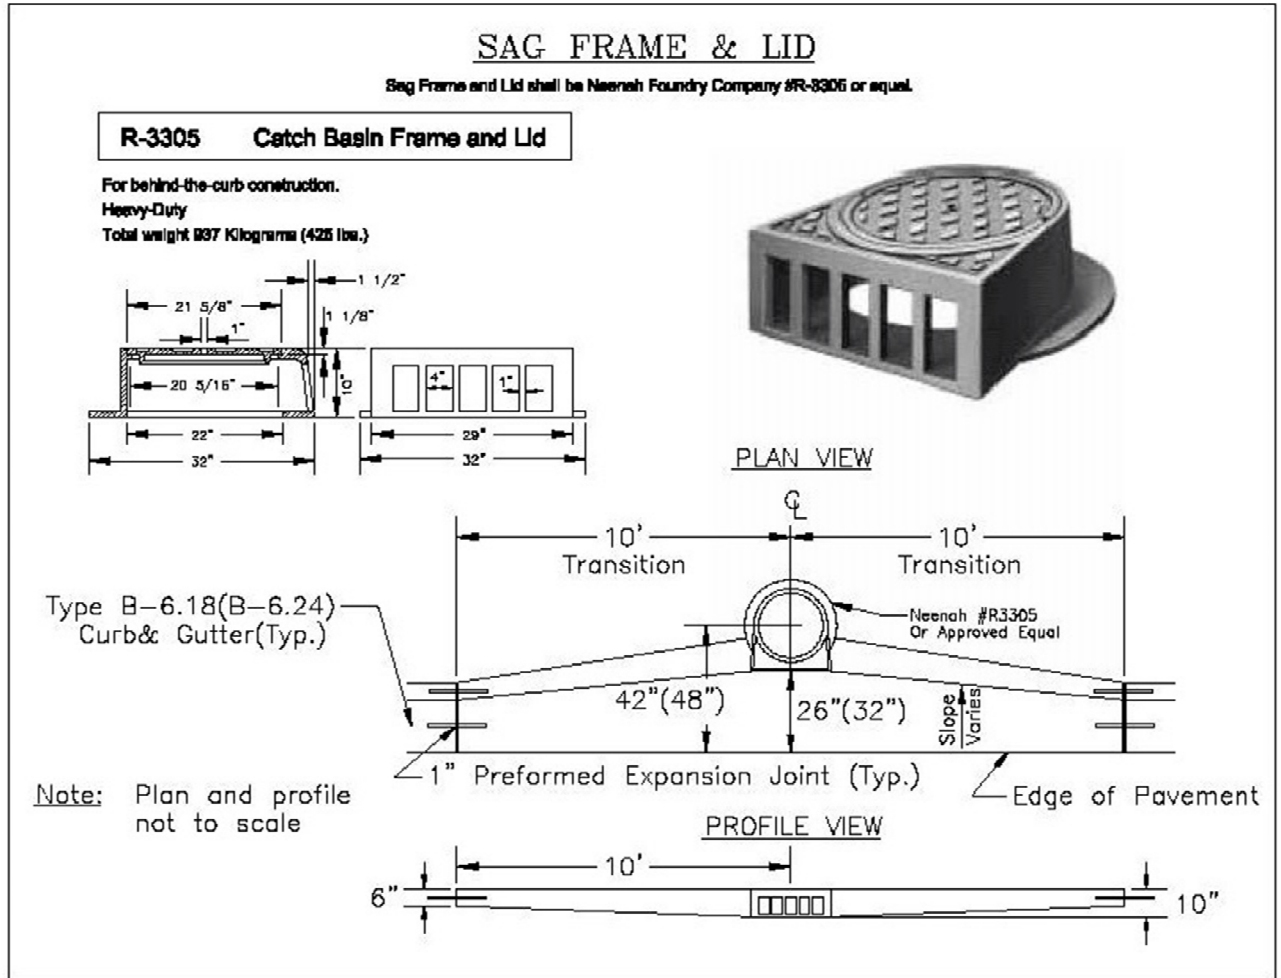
DuPage County Sag Frame and Lid Detail (Example)
